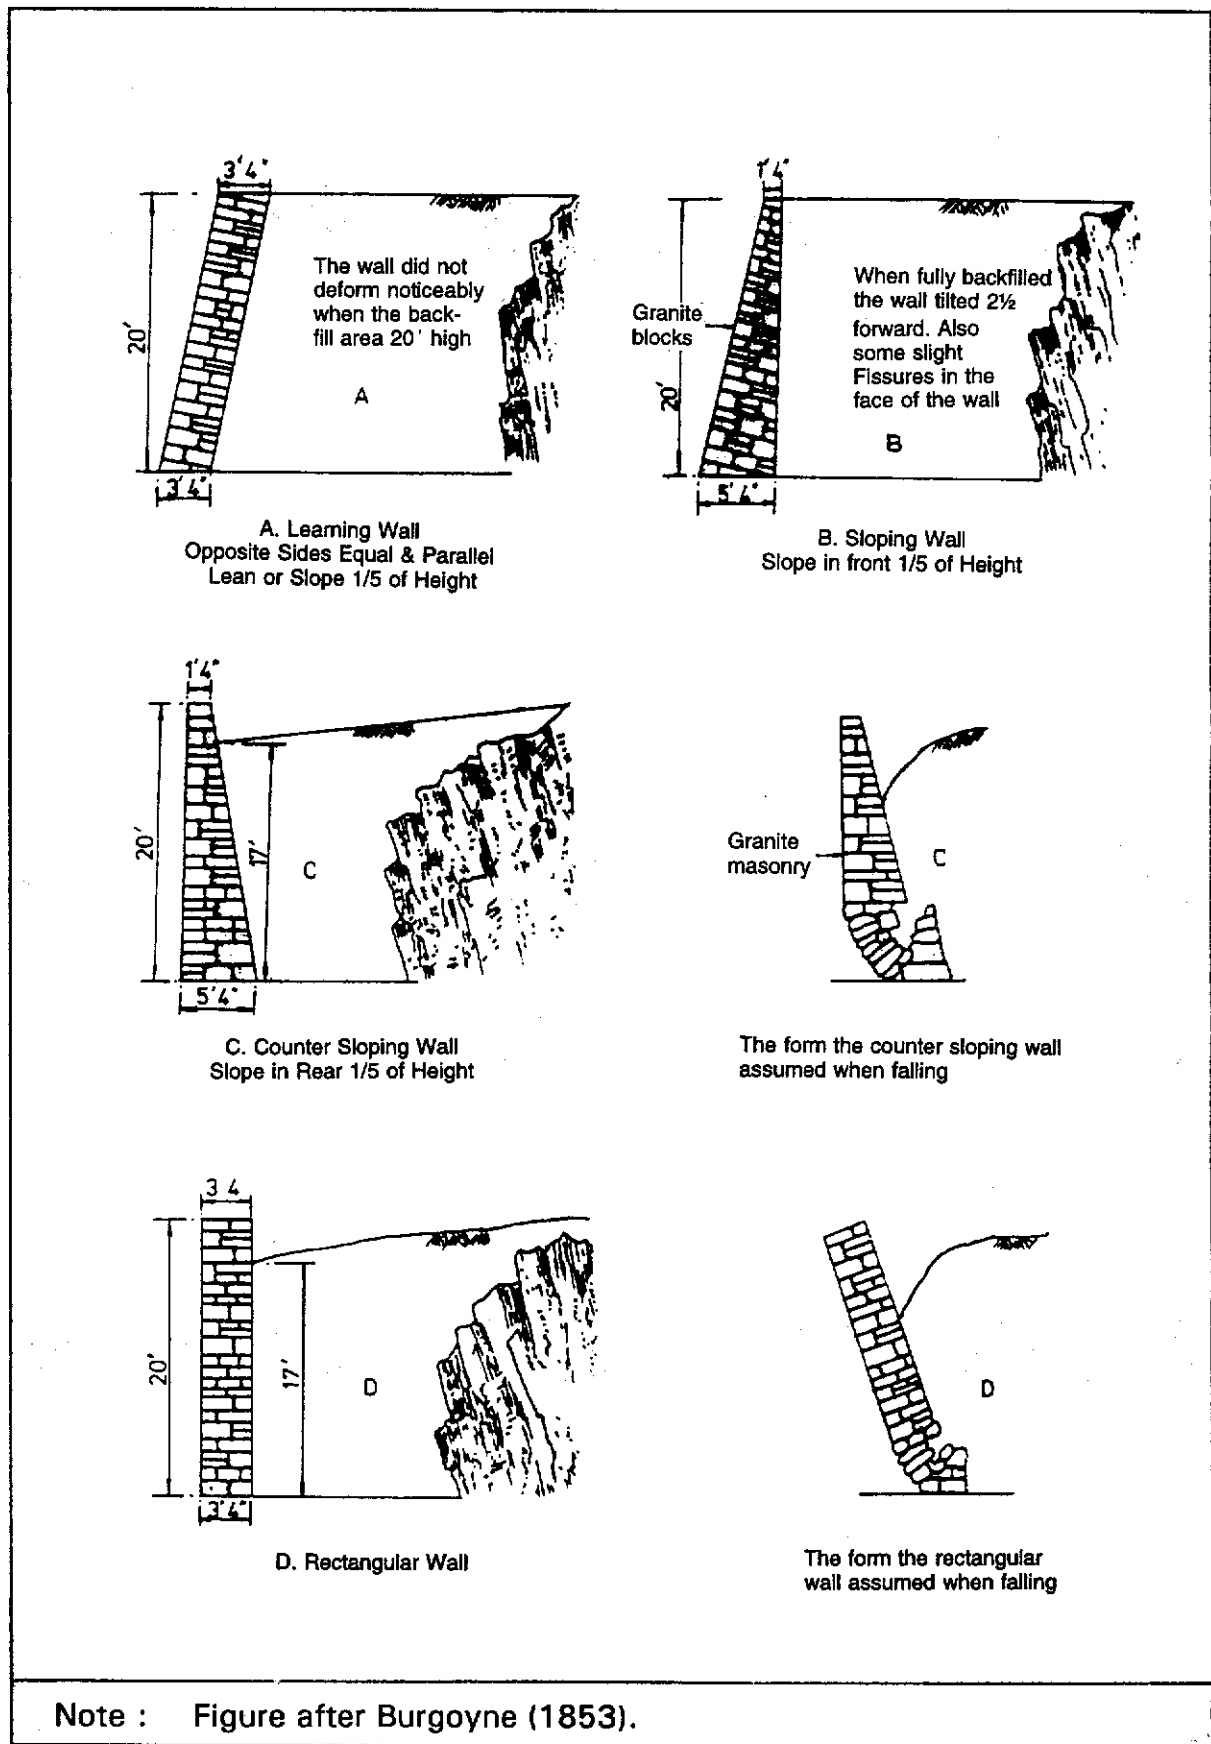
Burgoyne's Experiment on Masonry Retaining Walls - Geometry of the Walls
